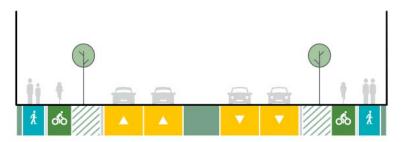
CFAF Outcome S4: Brigham Creek Road to Hobsonville Point Road Indicative 30m cross section
